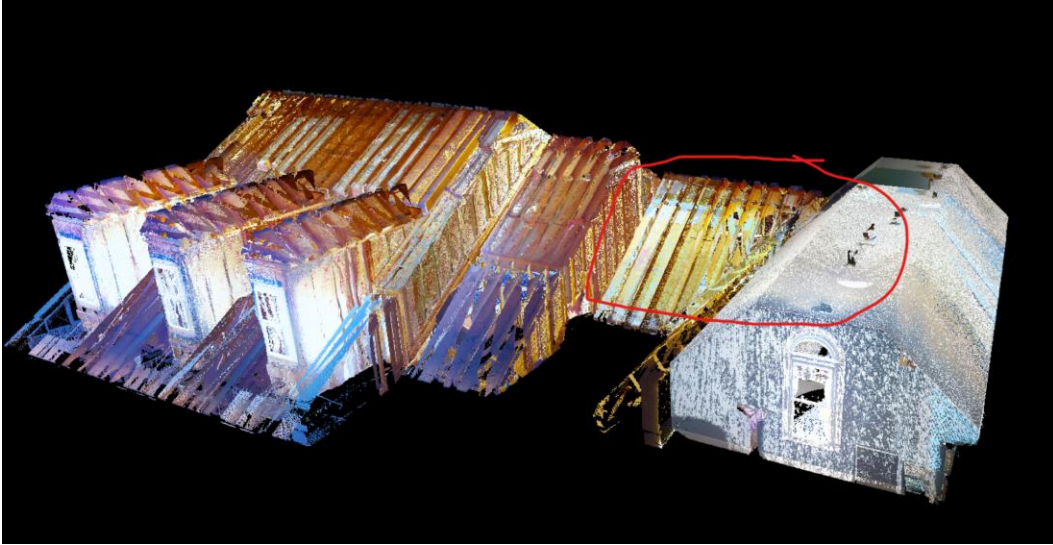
Sloped Ceiling Outside Primary Walking Path (Point-Cloud Cross View)
